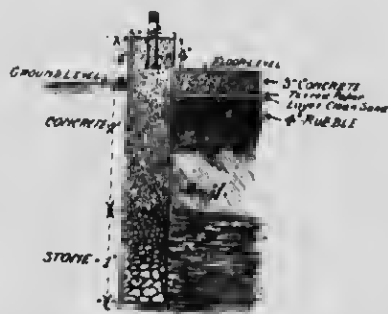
Showing construction of foundation wall and floor for poultry houses.
